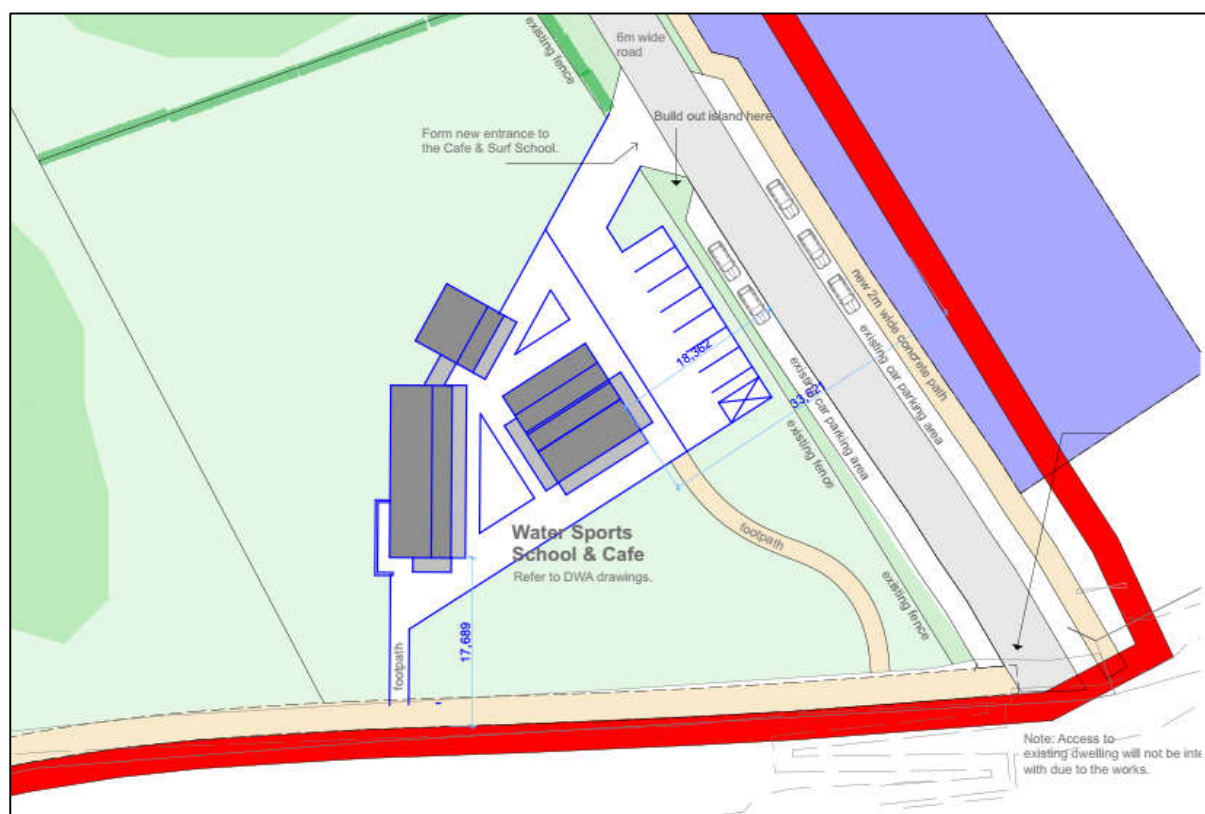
Integration of existing beach road parking into proposed upgrade and widening of the road, and potential future public parking area (purple shading).
